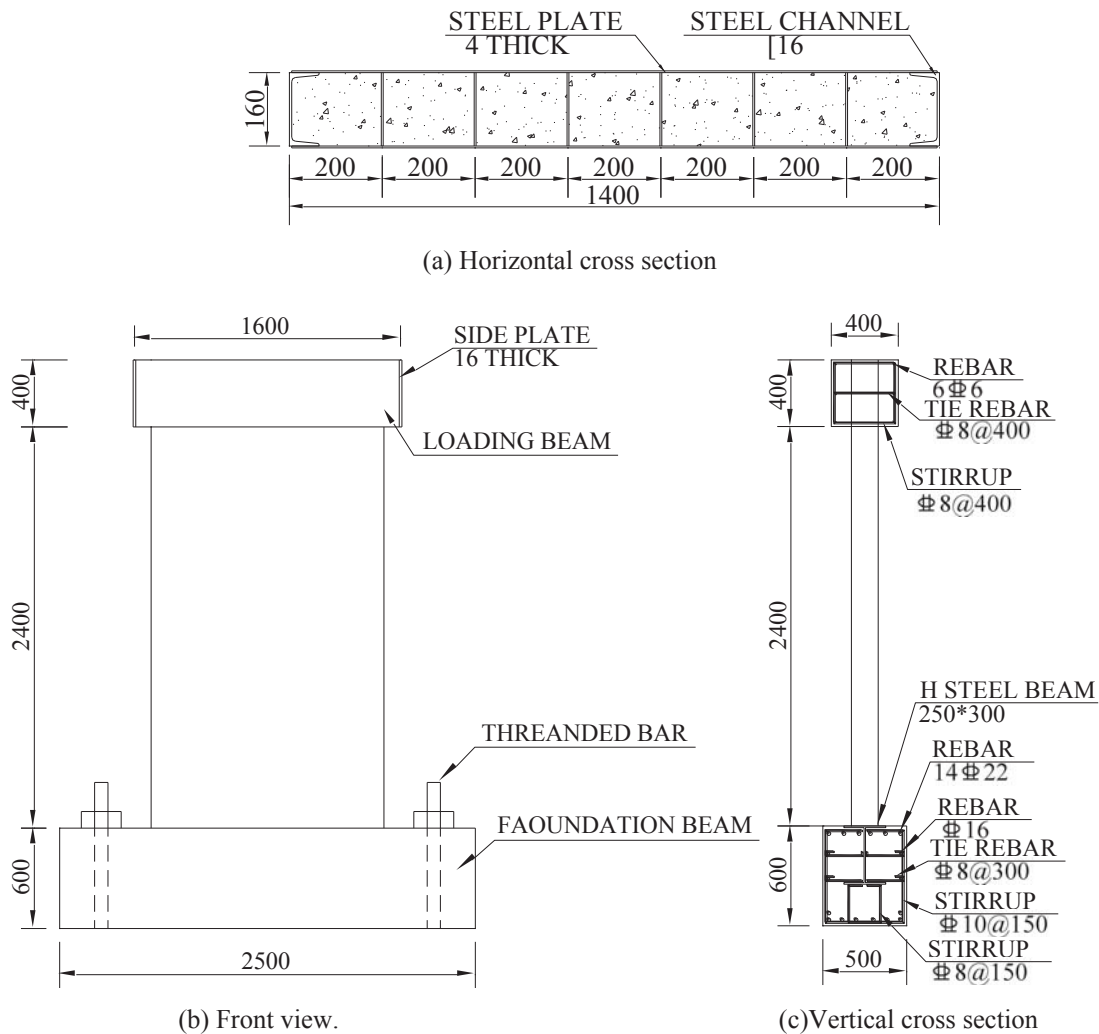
Details of two shear walls of previous test. (Unit: mm, adapted from S. Ye [9])
